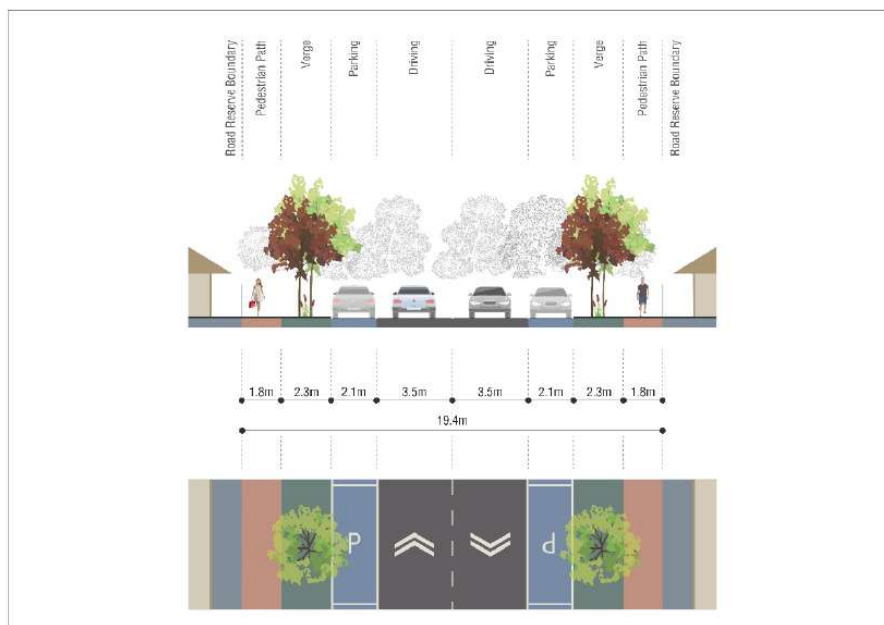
RD18 Brae Road (East of TOD Connector Boulevard) and RD18A Brae Road (South of TOD Connector Boulevard) Cross Section
